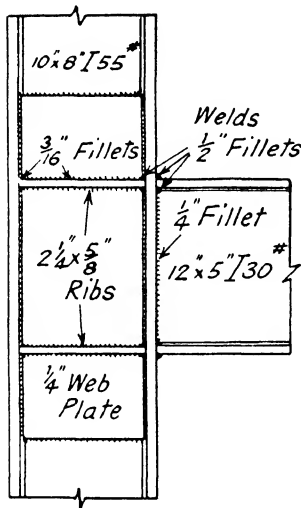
RIGID BEAM-TO-COLUMN CONNECTION FOR OUTSIDE COLUMN
